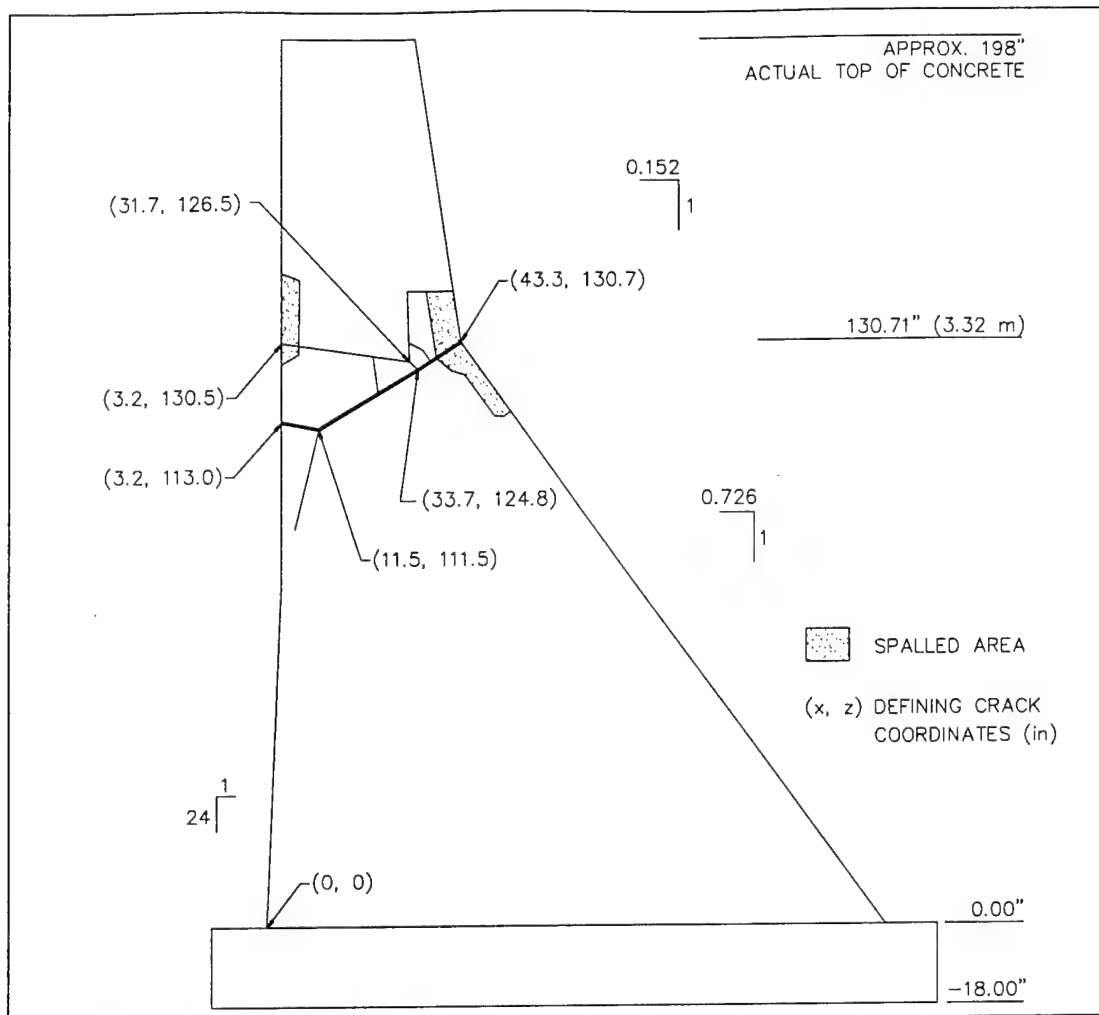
The horizontal portion of crack on front face, measuring 8.3 in. (210 mm) long.
